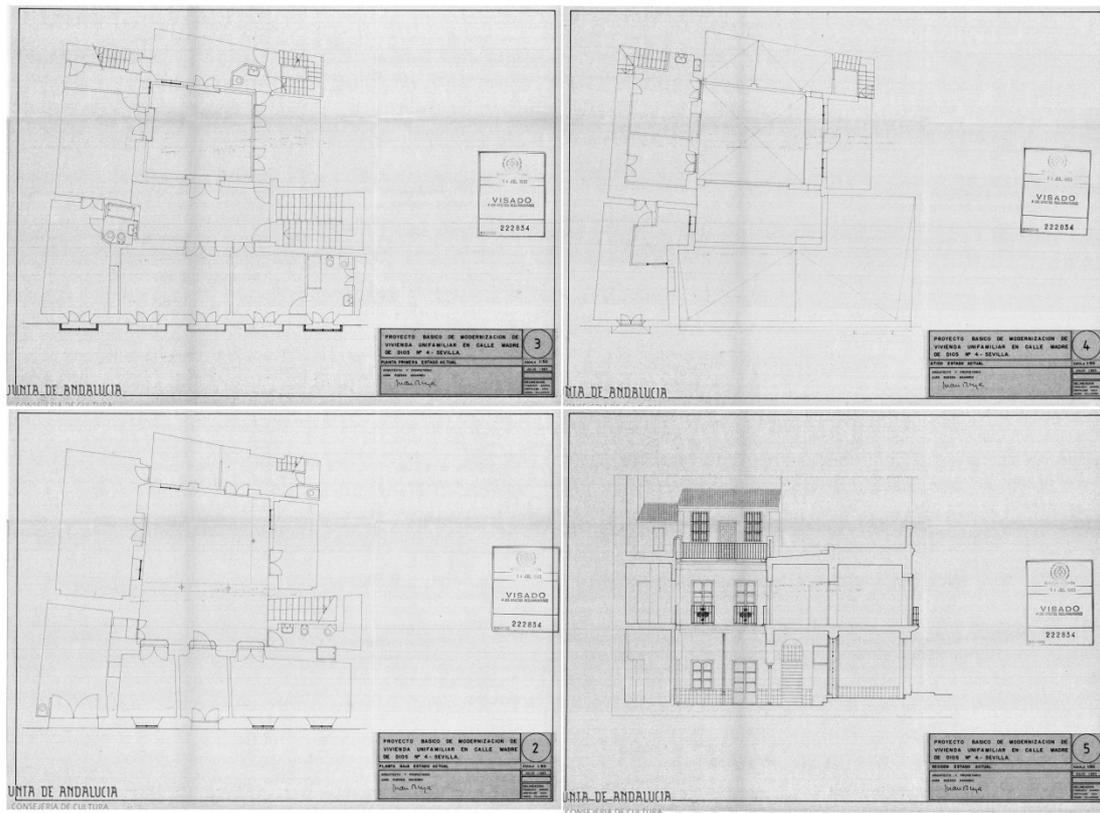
Floor plans and elevation of the house in Madre de Dios Street (Cruces 1 house of our research facing Madre de Dios Street). Seville, 1983. © Junta de Andalucía.
